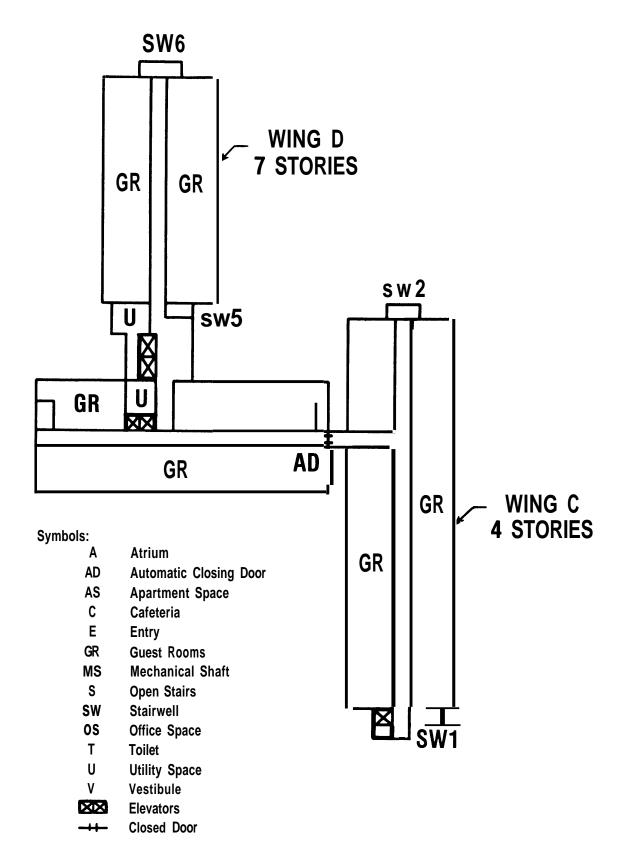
Typical Floor Plan above the First Floor for Building 2
